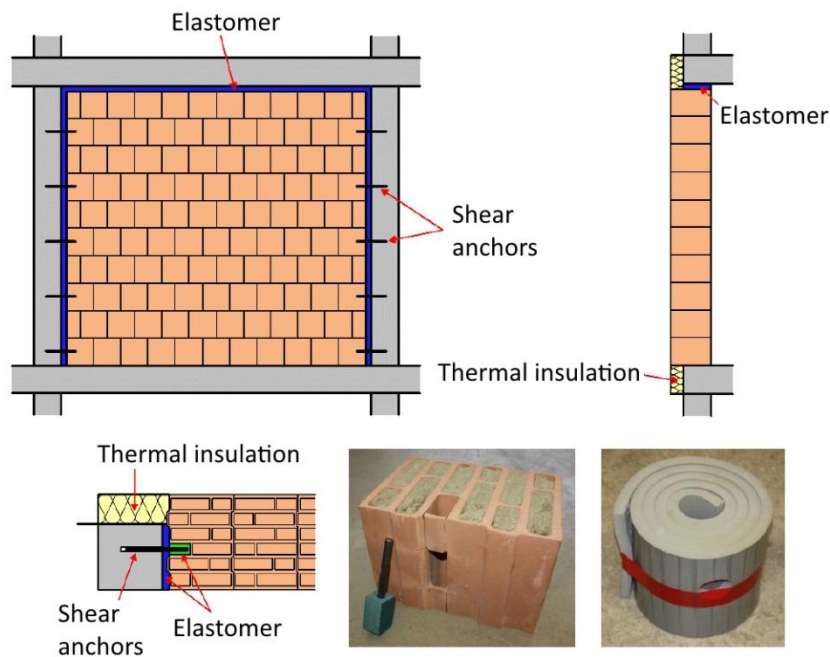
Front view and vertical and horizontal section of the IMES system, with the perforated brick and elastomer strips prepared for installation (INSYSME, 2017a)
